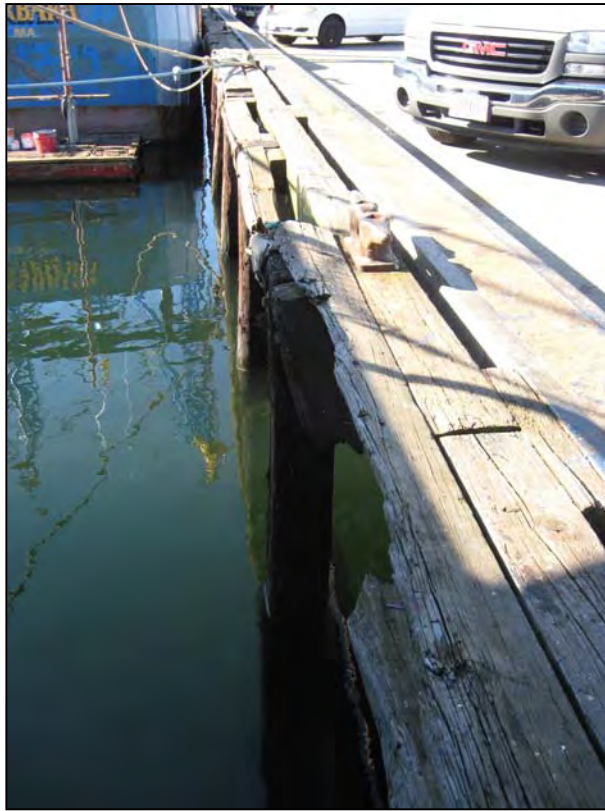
Typical fender section with broken chock and damaged or missing cap board.
